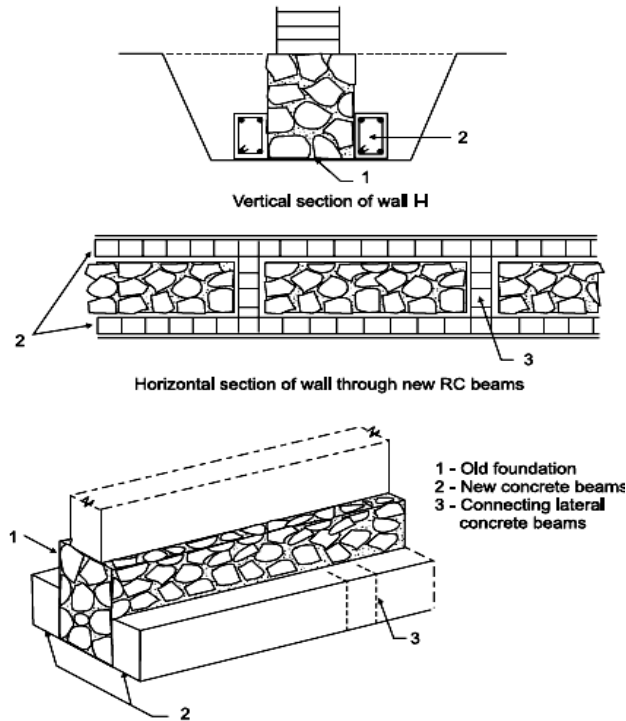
Improving a foundation by inserting lateral concrete beams strengthening existing walls
